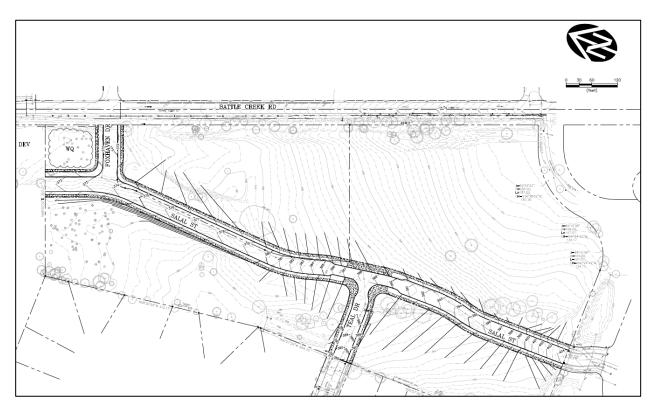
Topographic map of CDP Salem Gateway. Contour interval is 1-foot. (Source: Overall Grading & Drainage Plan by Westech Engineering, Inc., dated March 2021)
